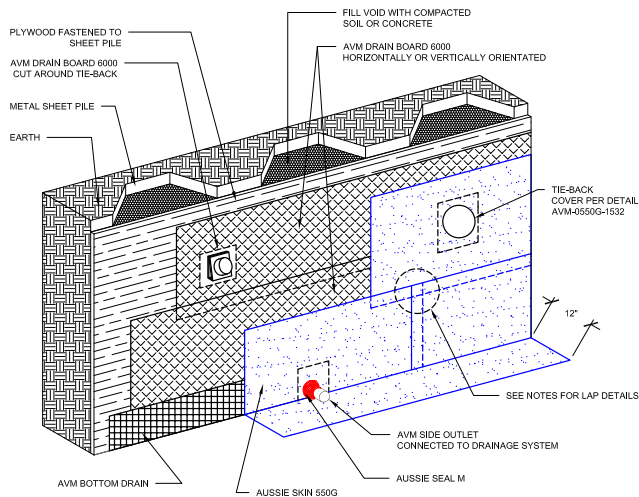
SHEET METAL PILING TRANSITION
